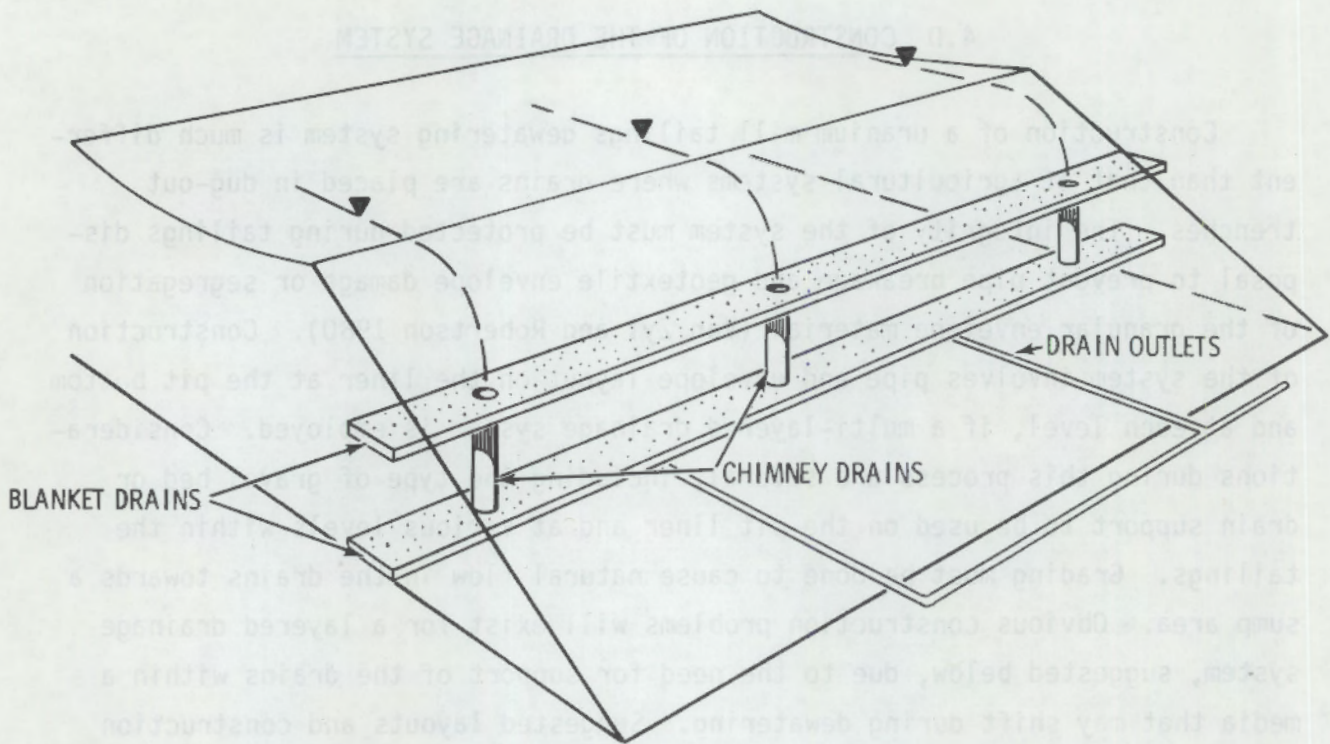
Chimney Drains for Embankment Disposal (Van Zyl and Robertson 1980)
